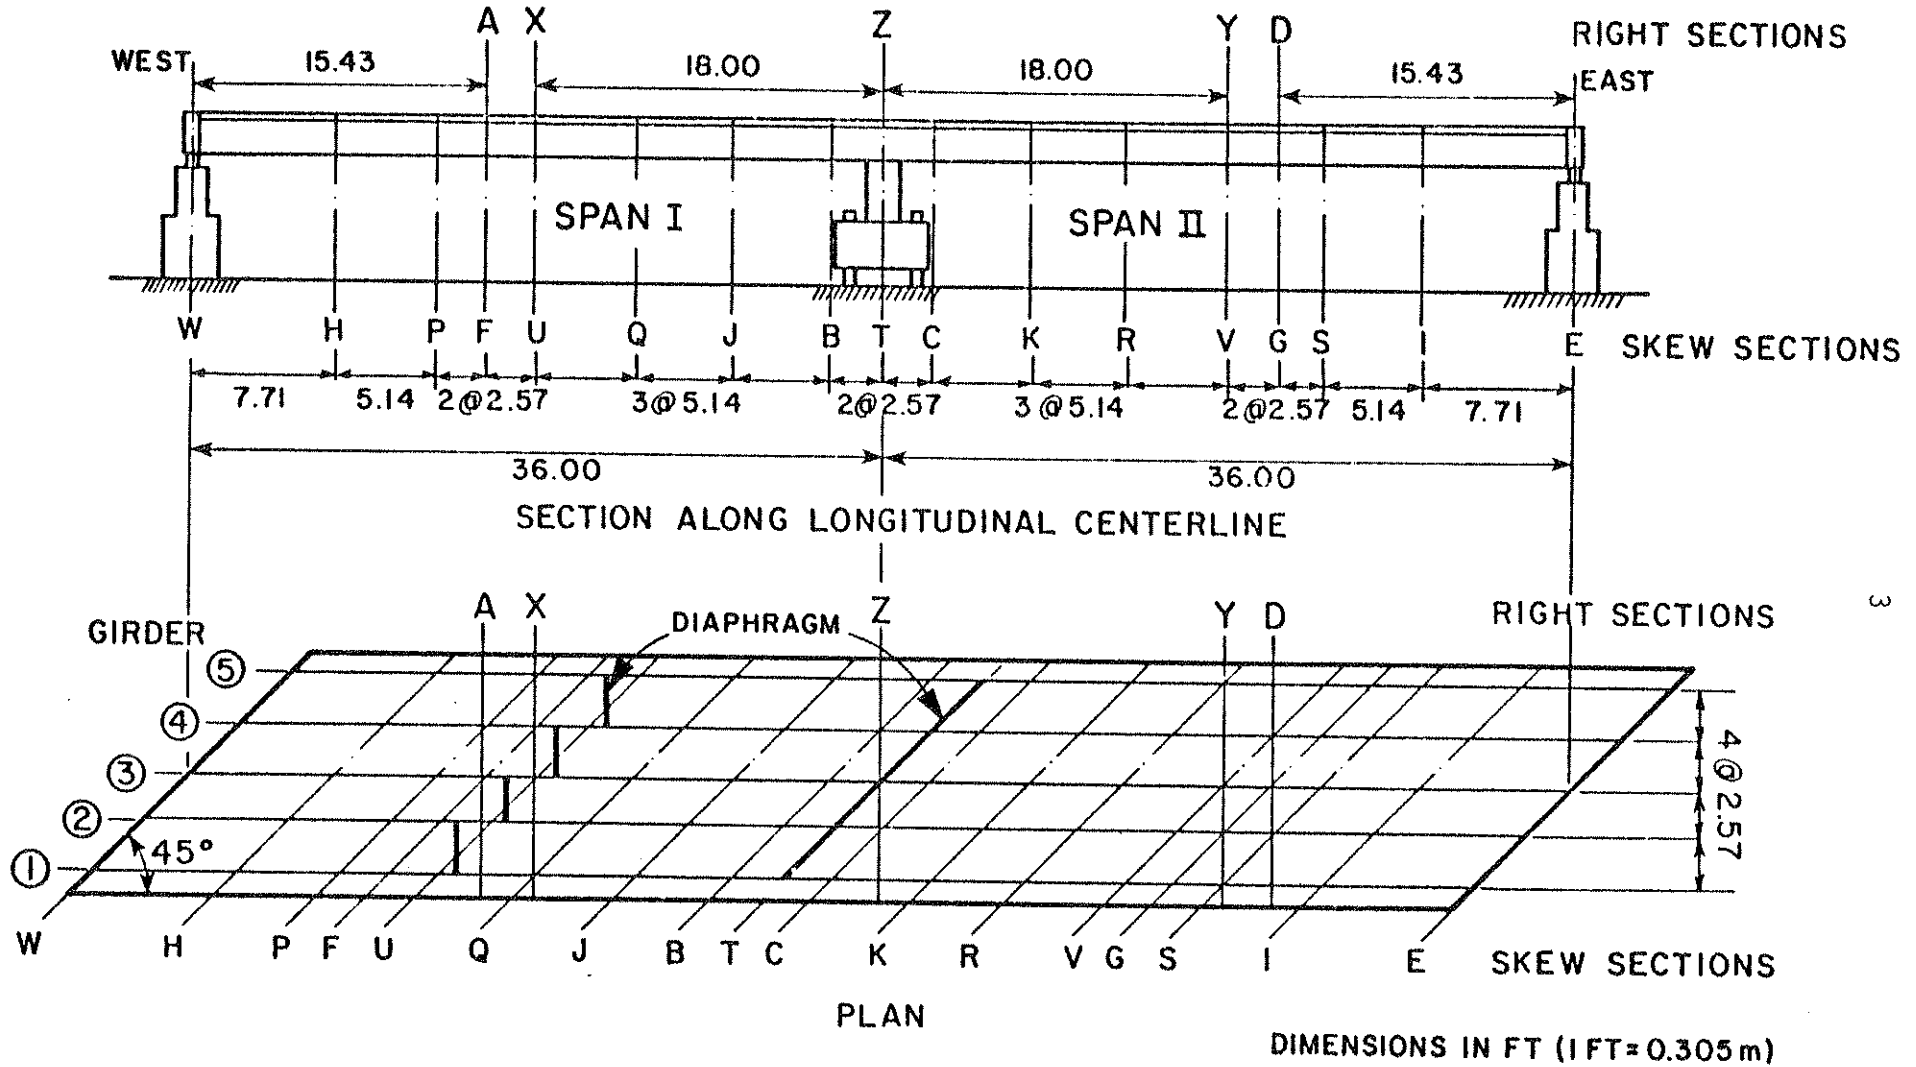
DIMENSIONS OF BOX GIRDER BRIDGE MODEL WITH LOCATIONS OF TRANSVERSE SECTIONS AND LONGITUDINAL GIRDER LINES
